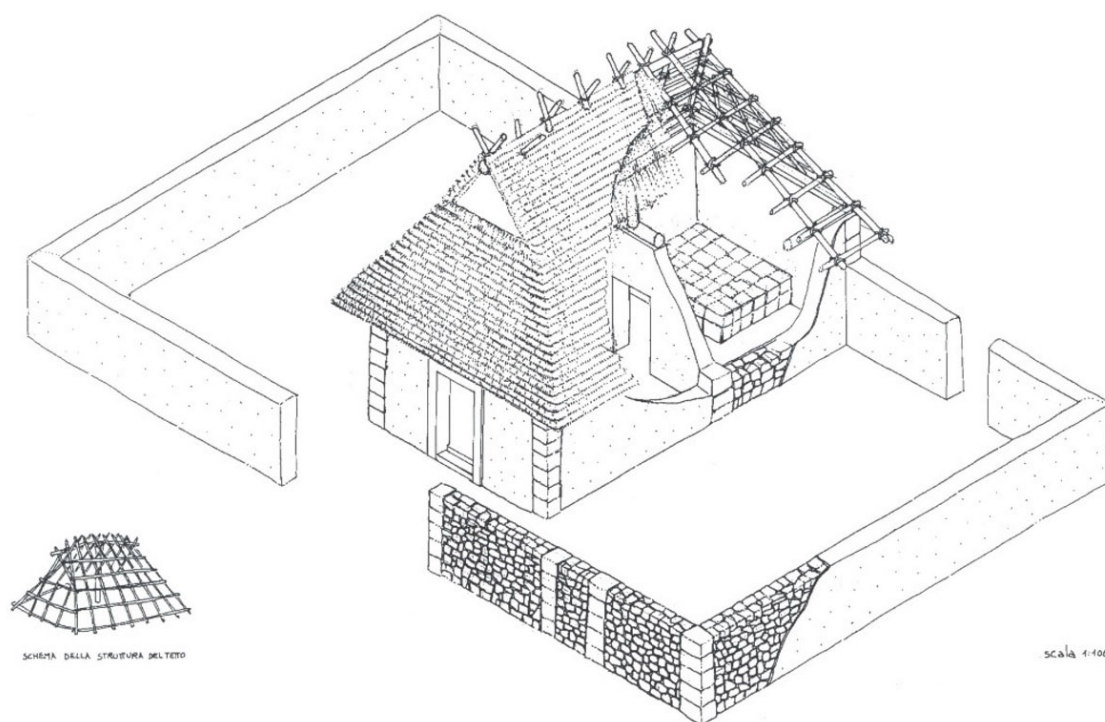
Reconstruction of the elevation and plans of building β with the sacred enclosure.
